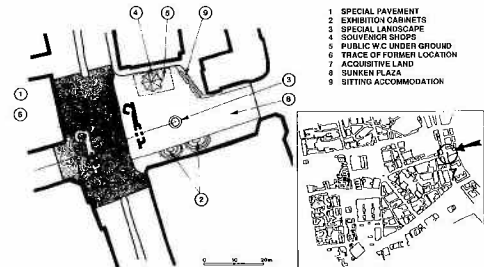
(a) Plan of city walls superimposed on present layout of Kasr Al Hokm district
